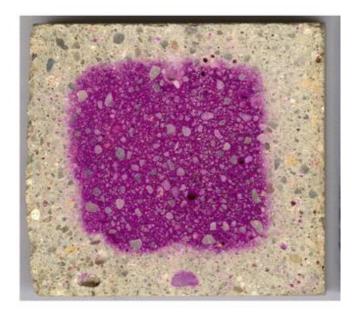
Concrete Section treated with phenolphthalein solution (Chinchón-payá, Andrade & Chinchón 2016)
